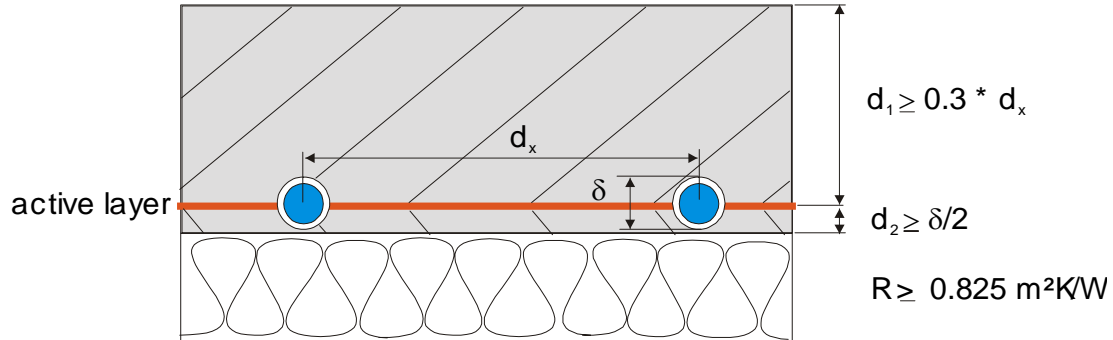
Wall with an ACTIVE LAYER for floor heating or cooling
